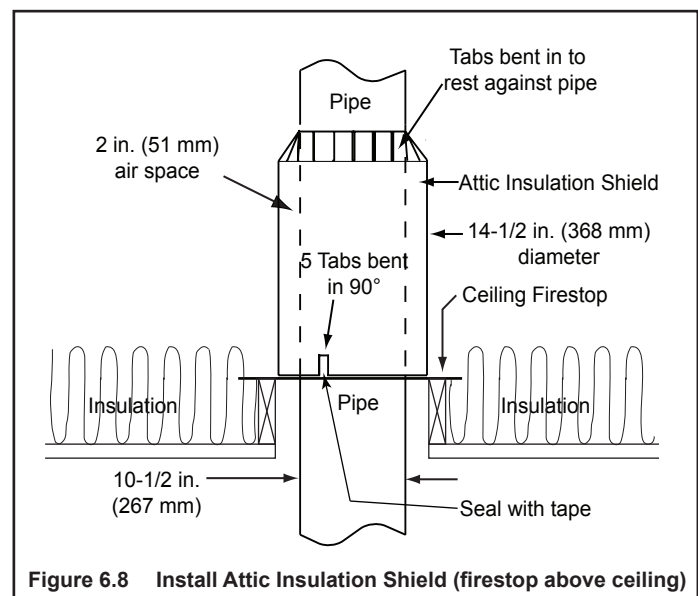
Install Attic Insulation Shield (firestop above ceiling)
